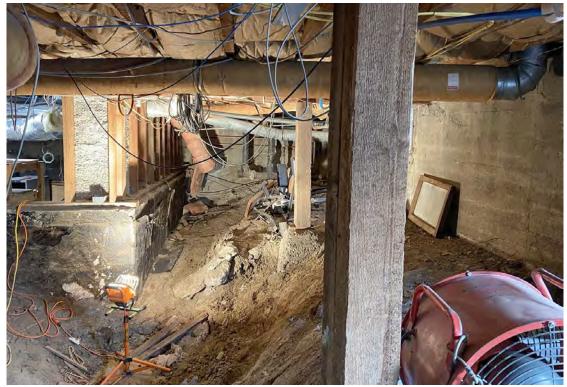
Utility conduits and trenching/excavation area in unfinished portion of basement
